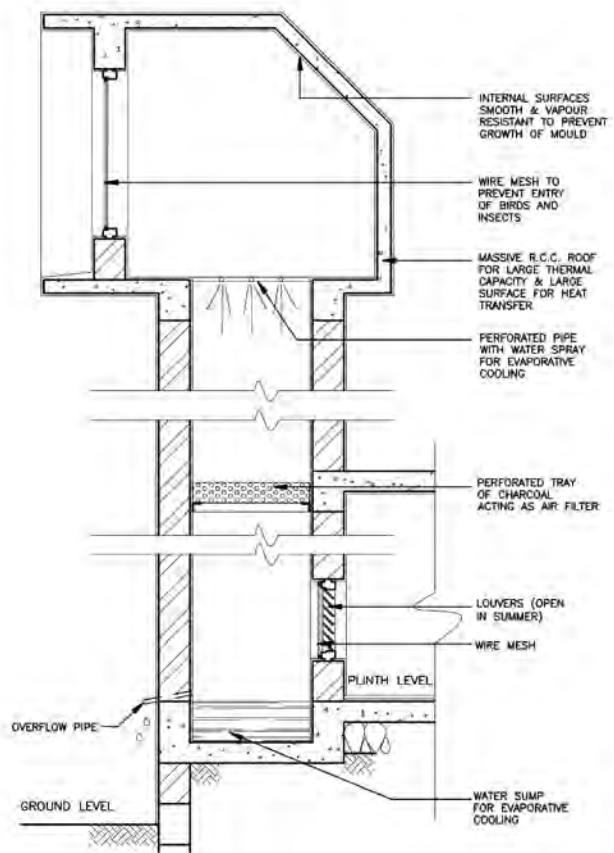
Cross Sectional details of Passive Downdraft Evaporative Cooling.
